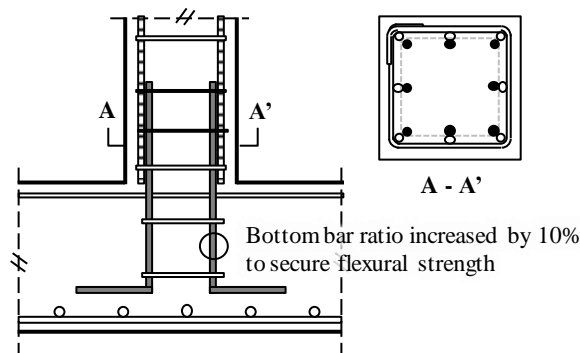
Lap splice detail between a pedestal and a 1st column
